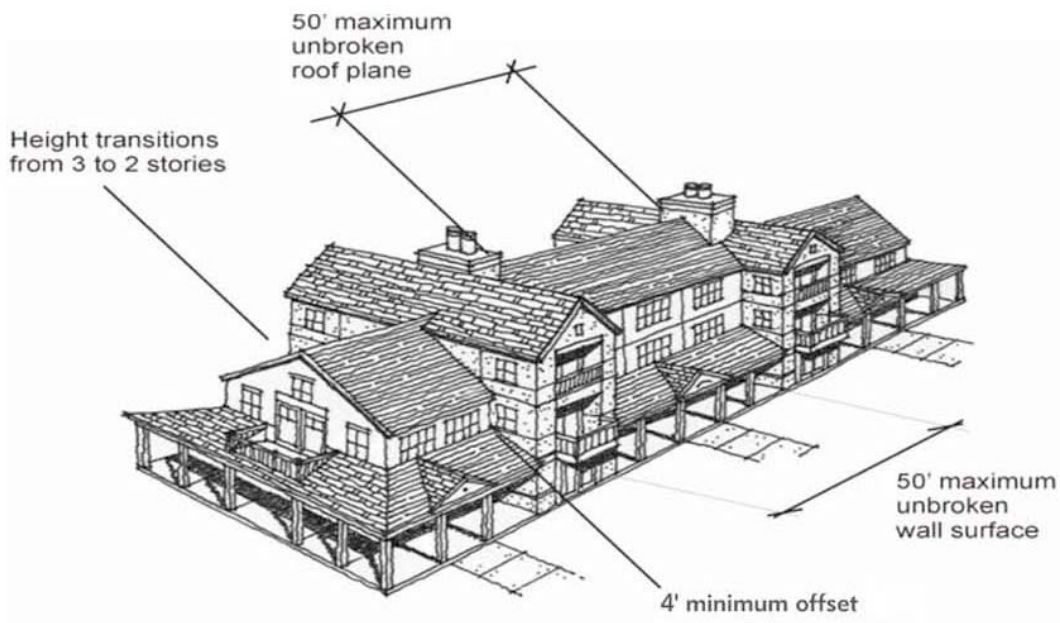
Examples of Varied Roof Planes and Wall Surfaces
